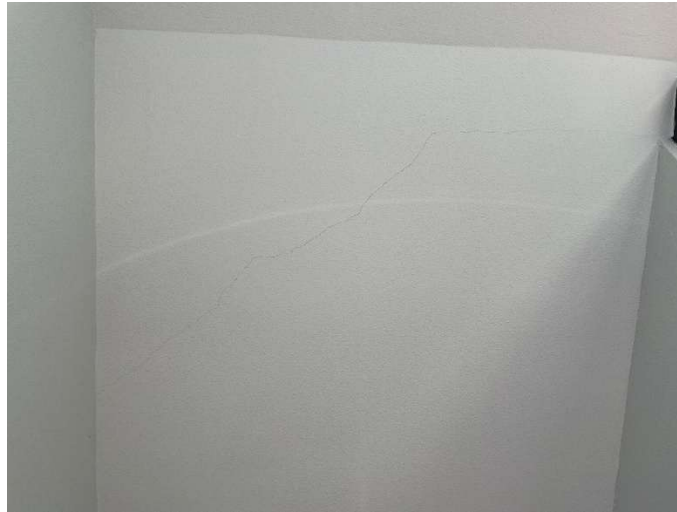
Cracking in Gypsum Ceiling adjacent to Sinking Post at Stair Landing
